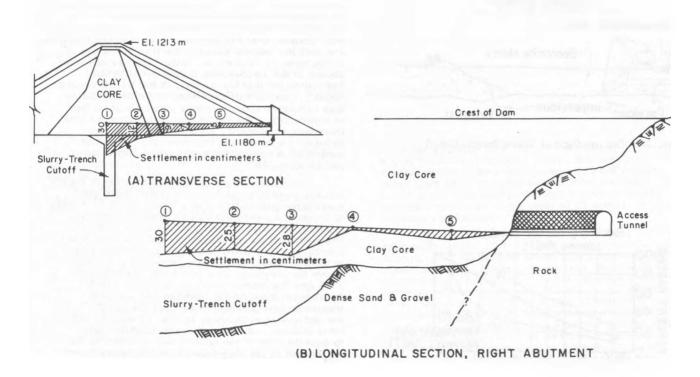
Settlement of Slurry Trench Cutoff, Tortolos Dam
